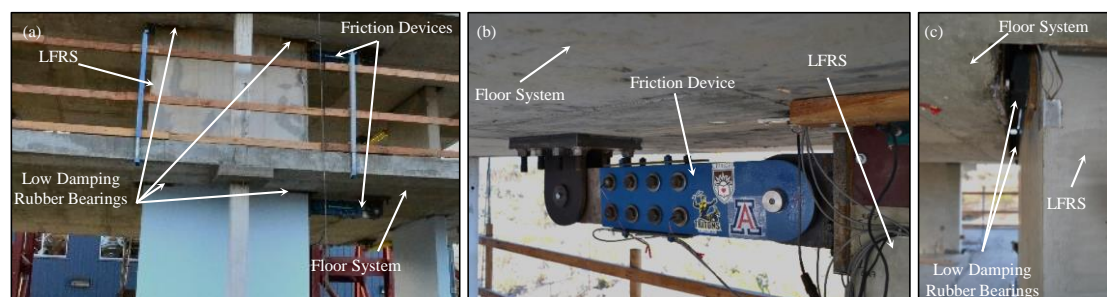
Implementation of the deformable connection on a rocking precast concrete shear wall structure at NEES@UCSD equipment site
